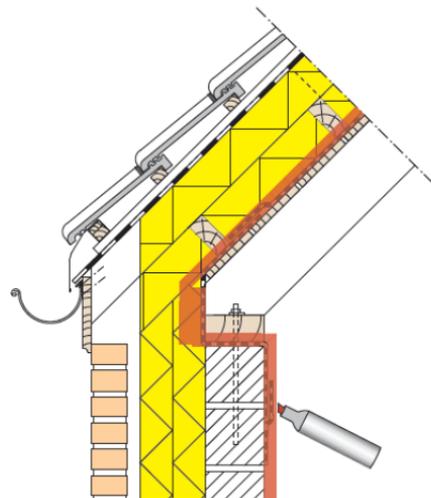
Conception of a building detail in order to guarantee the continuity of the building airtightness layer [3]
